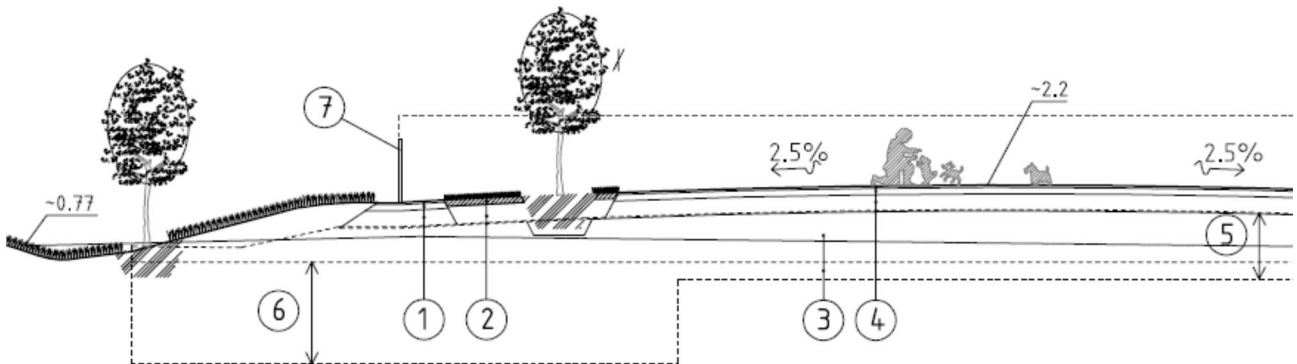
Dog Park. Cross section of the mass stabilised structure (embankment + subsoil).
